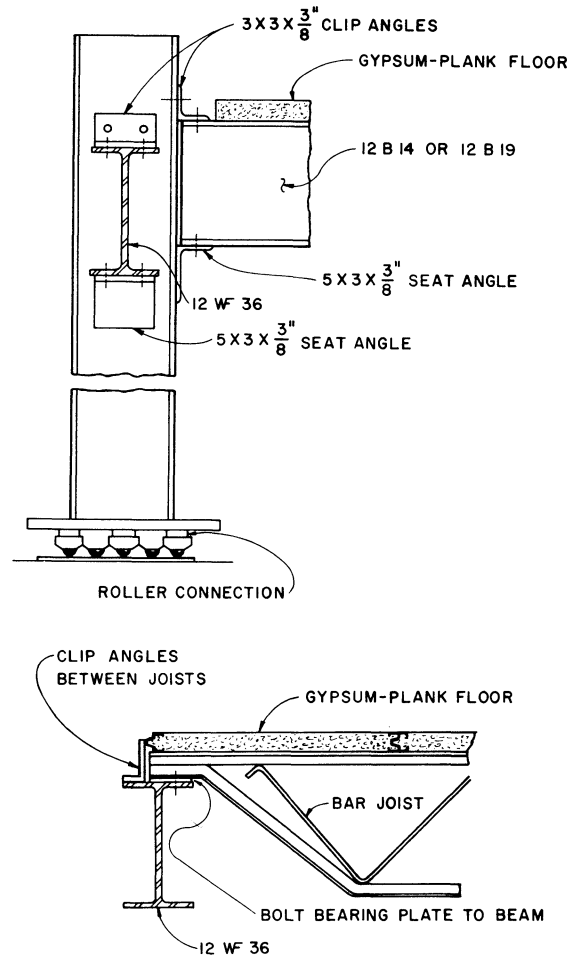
Connections—beam-to-column and bar joists-to-beam
